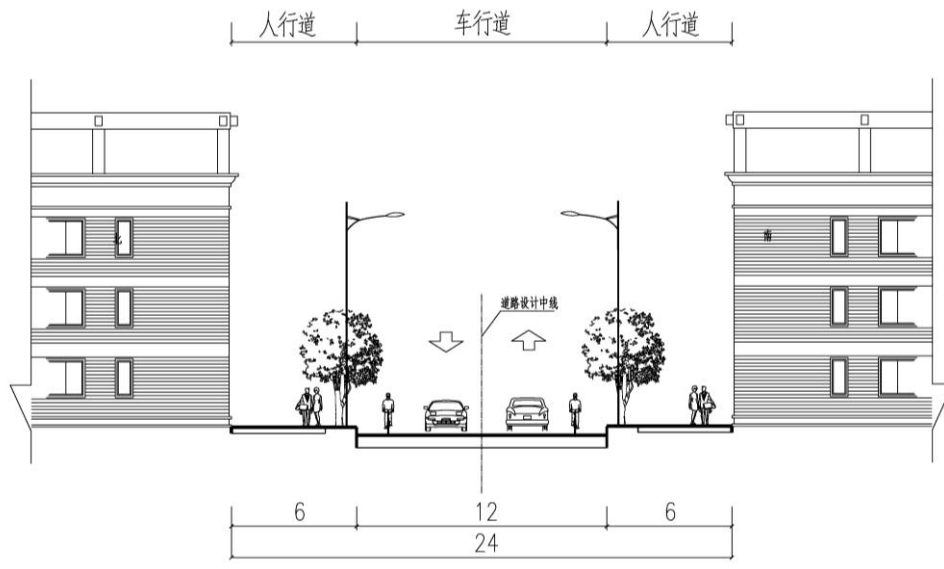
Sectional View of Existing Biyun Road (Binhe Road ~ Handan Road)
